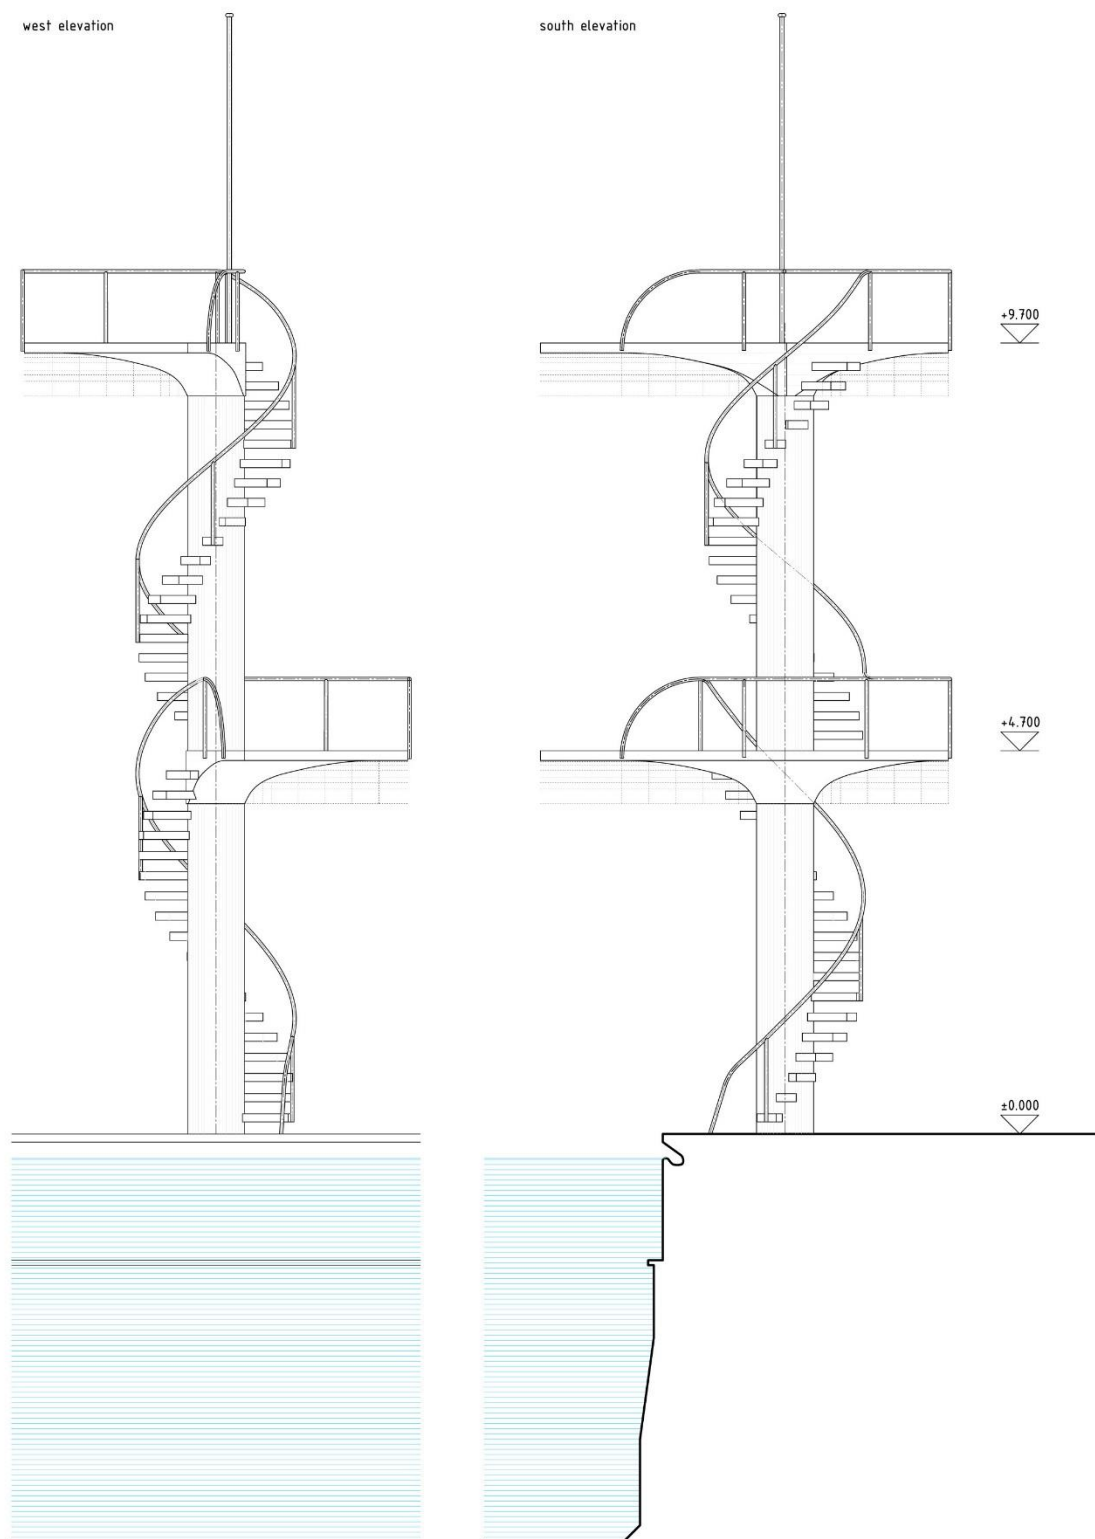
c) Reconstruction of the original state of the tower – elevations.
